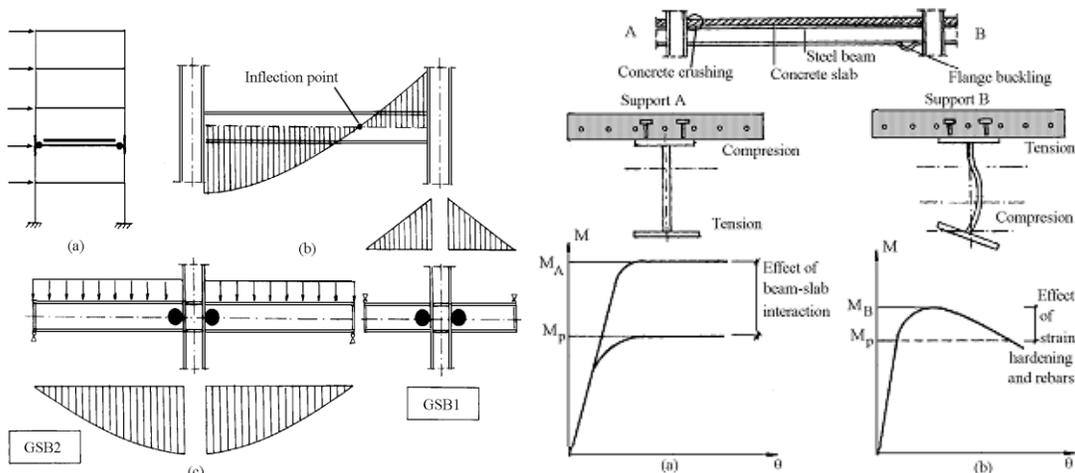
Behaviour of steel beams under real conditions and the use of the standard beam concept
